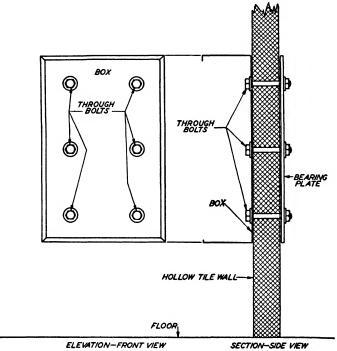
Method of Mounting a Large Pull Box to a Hollow Tile Wall
